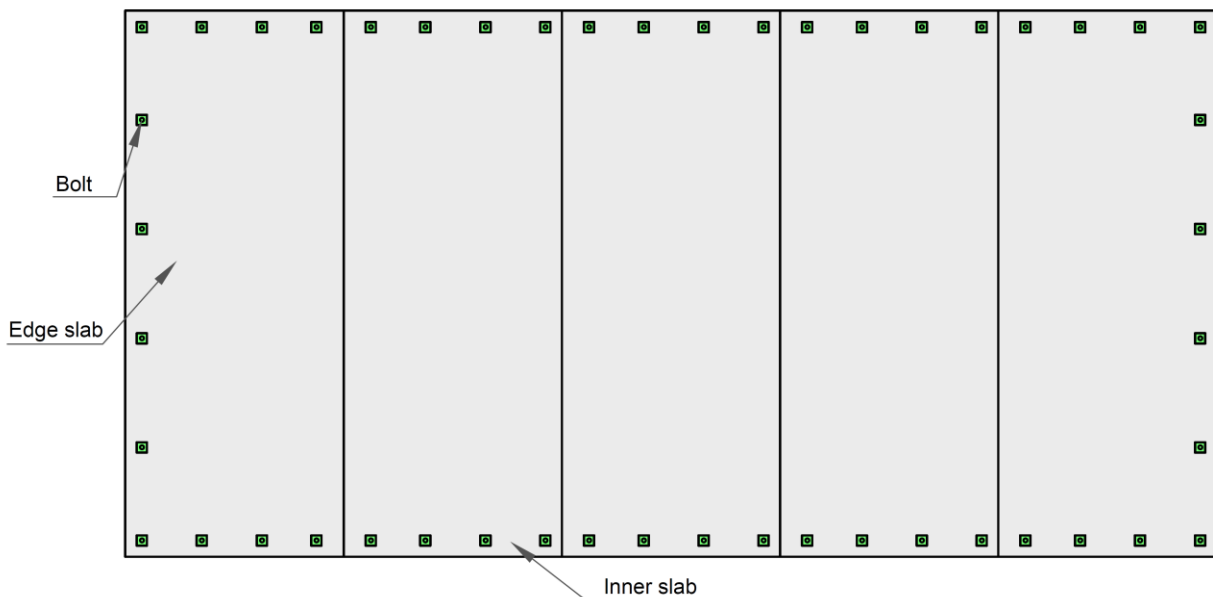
Connection concept for slab segments and beams – adapted from [30]
